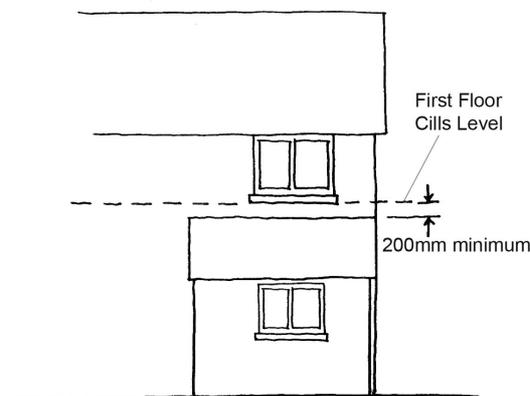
The highest part of single-storey rear extensions should be set below the first floor cills by at least 200mm.
